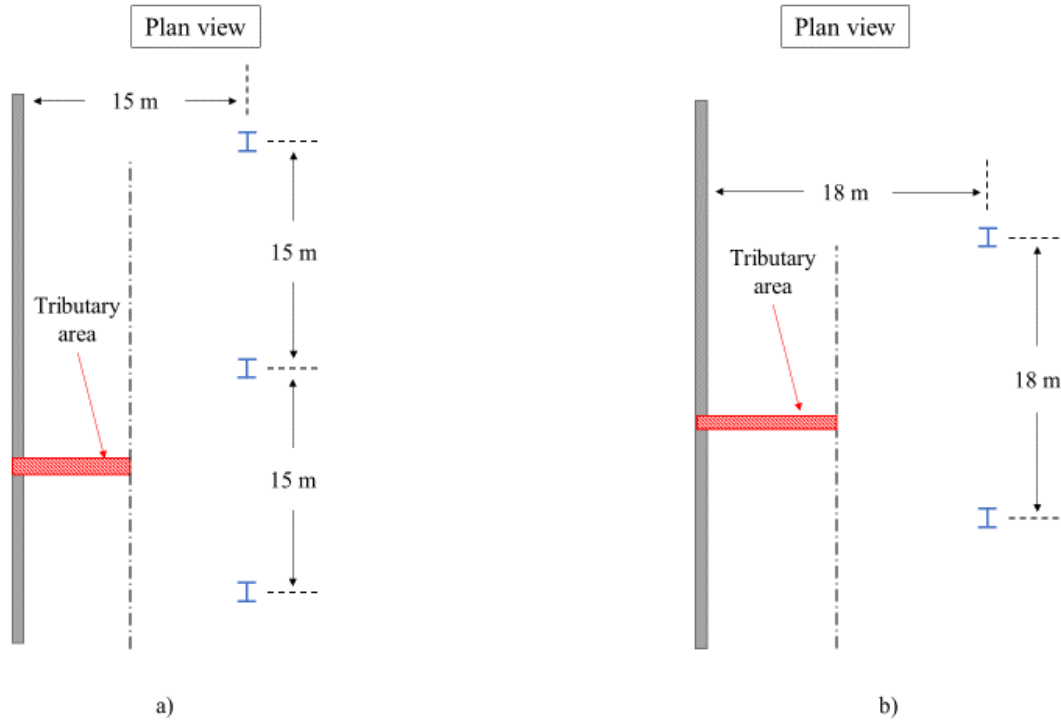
Typical layout and tributary area of warehouse wall: a) small warehouse, and b) large warehouse
